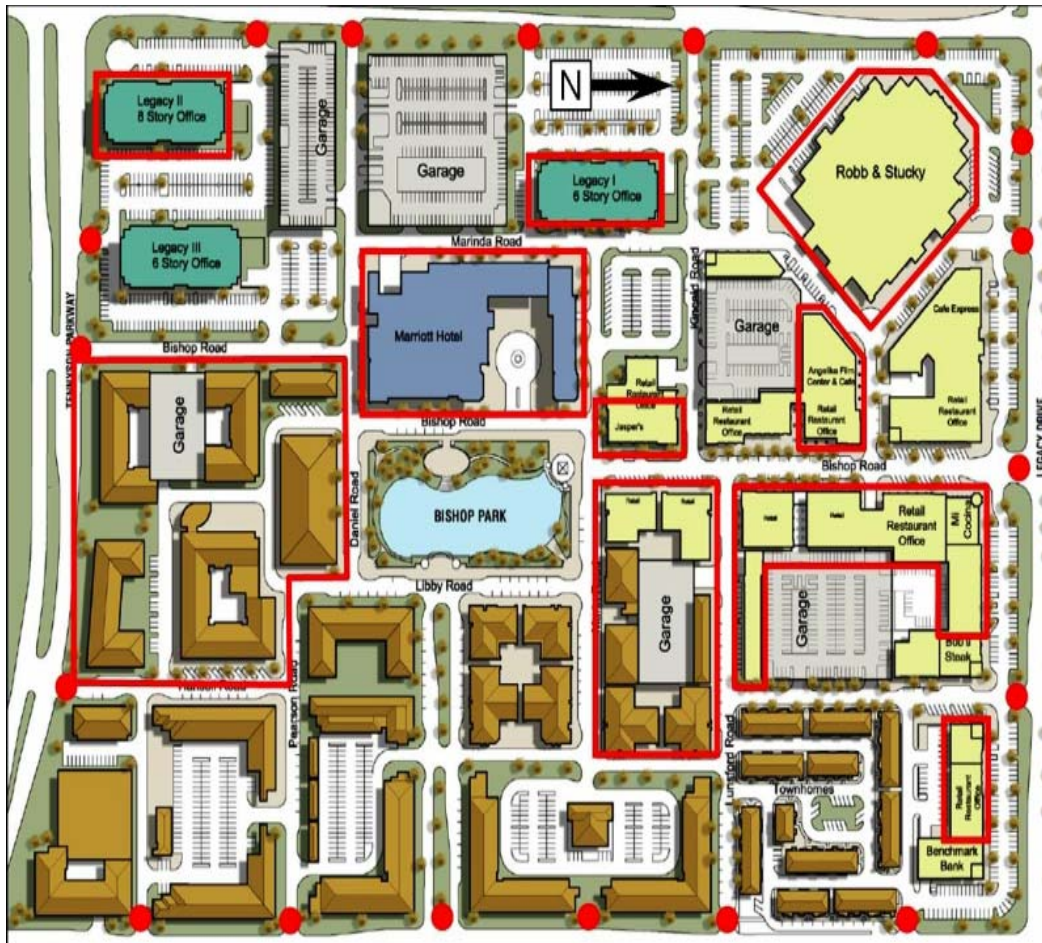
Legacy Town Center Illustrative Site Plan and Data Collection Sites
